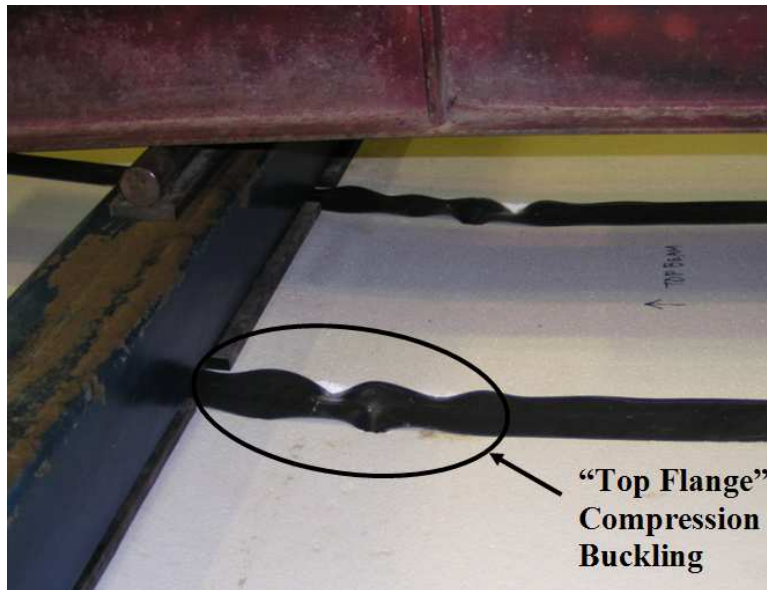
Compression Buckling on the Top Flange of the Furring Assembly
